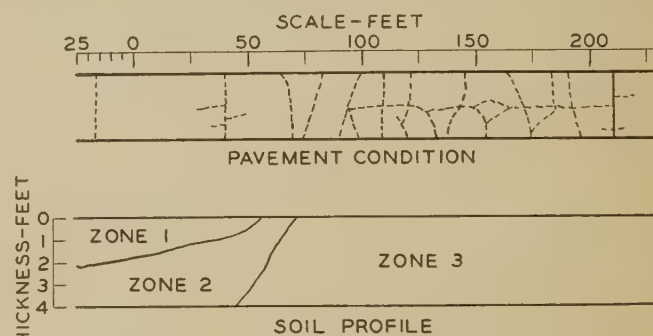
RELATION OF VARIOUS SOIL ZONES TO PAVEMENT CONDITION
